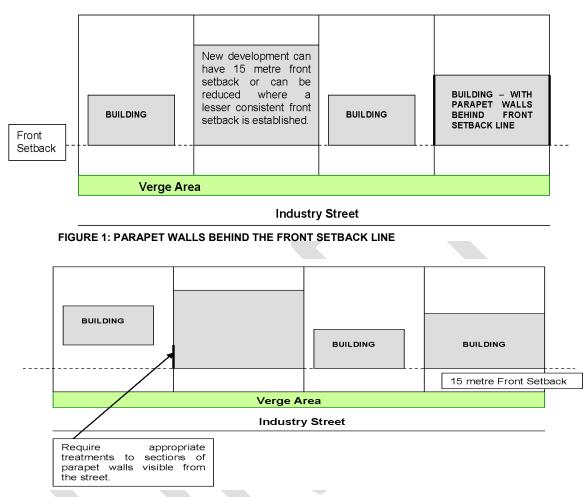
PARAPET WALLS VISIBLE WITH SUITABLE TREATMENT
